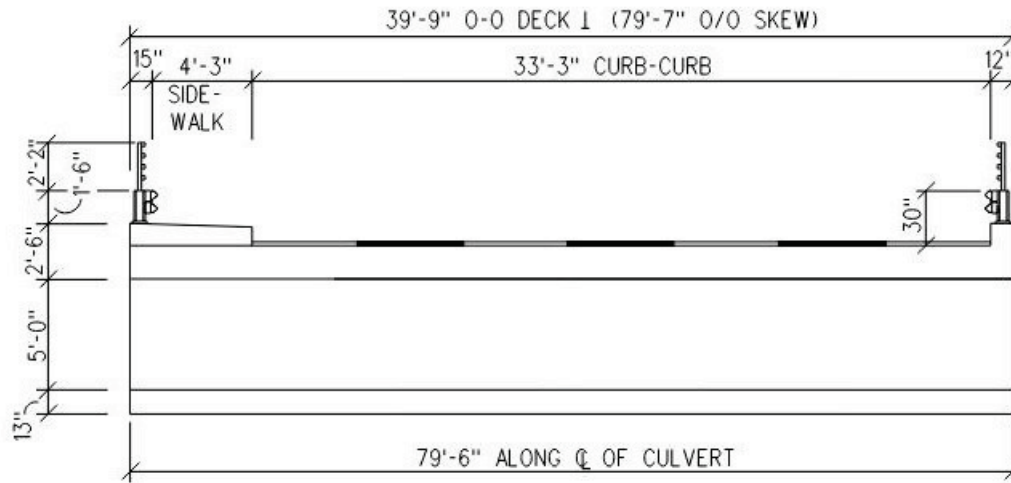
Existing typical section of County Road E 1/2 west of Bridge MESA-E.5-29.8
